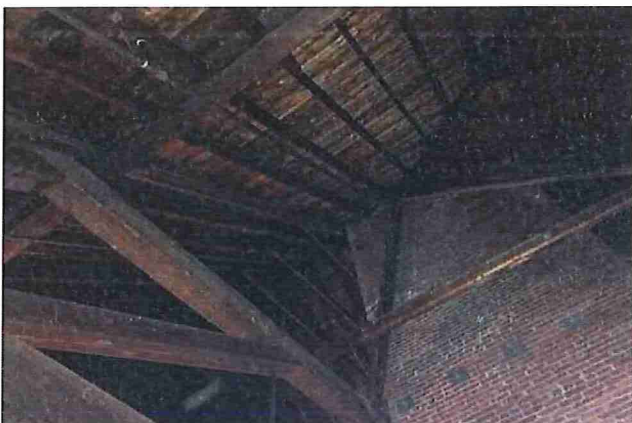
Water staining on the underside of the wood-plank deck and on roof rafters on the south side of the roof near the chimney.
